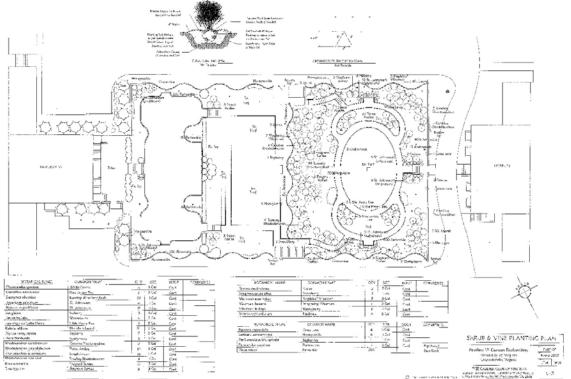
New plantings in Pavilion VI, West Gardens, progressed in 2007. This plan shows proposed planting for the project. (JAV-FMRC-FF-2007-100932_L_3-M-3-RileyAssocPavVIShrub Vine.JPG)
